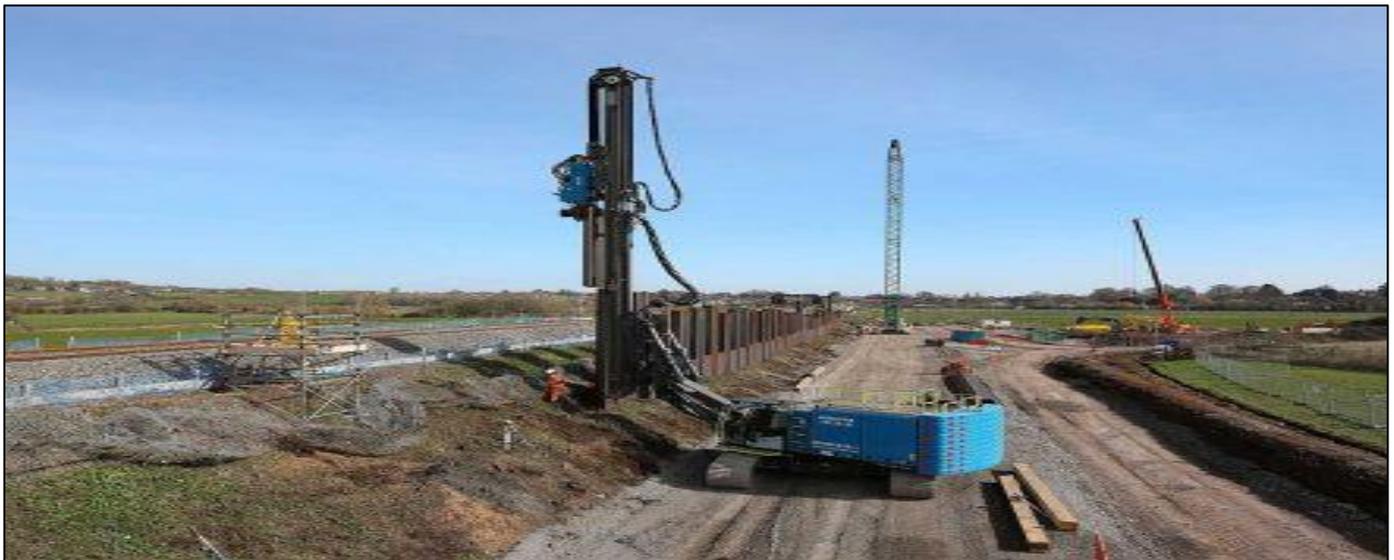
Somerset Railway Embankment Stabilized Using Sheet Pile Walls (geplus.co.uk 2021)
